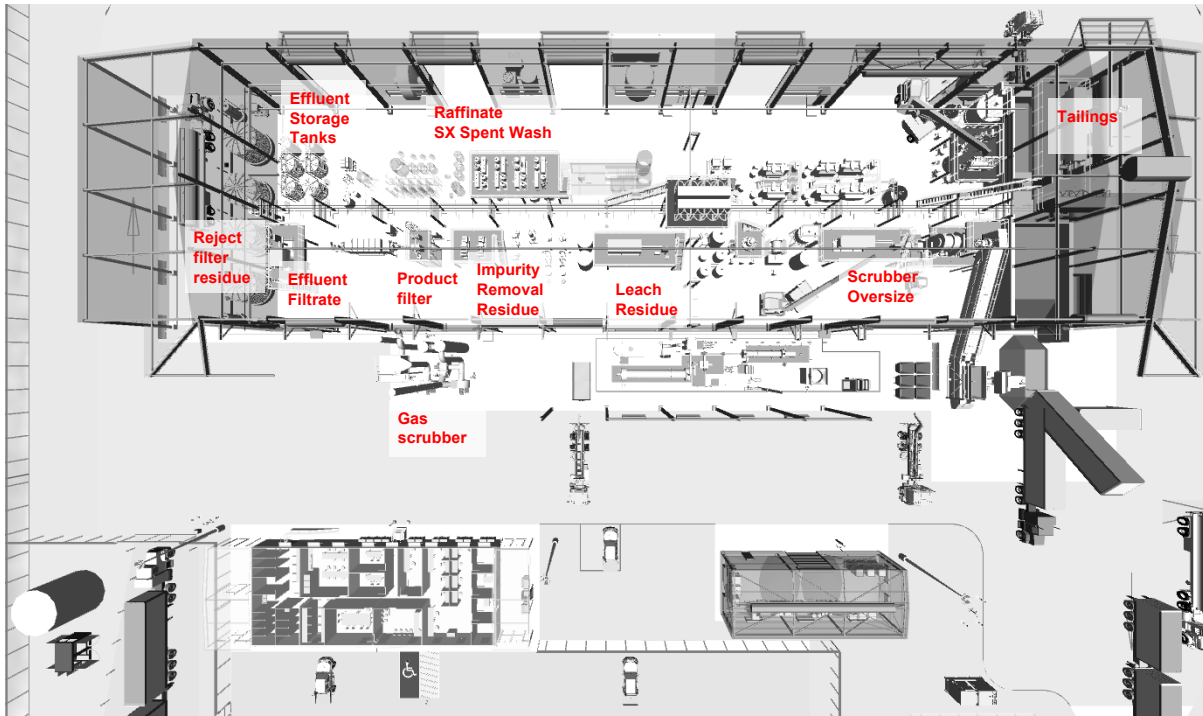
QRCUF Site Layout – Waste Generation Points
